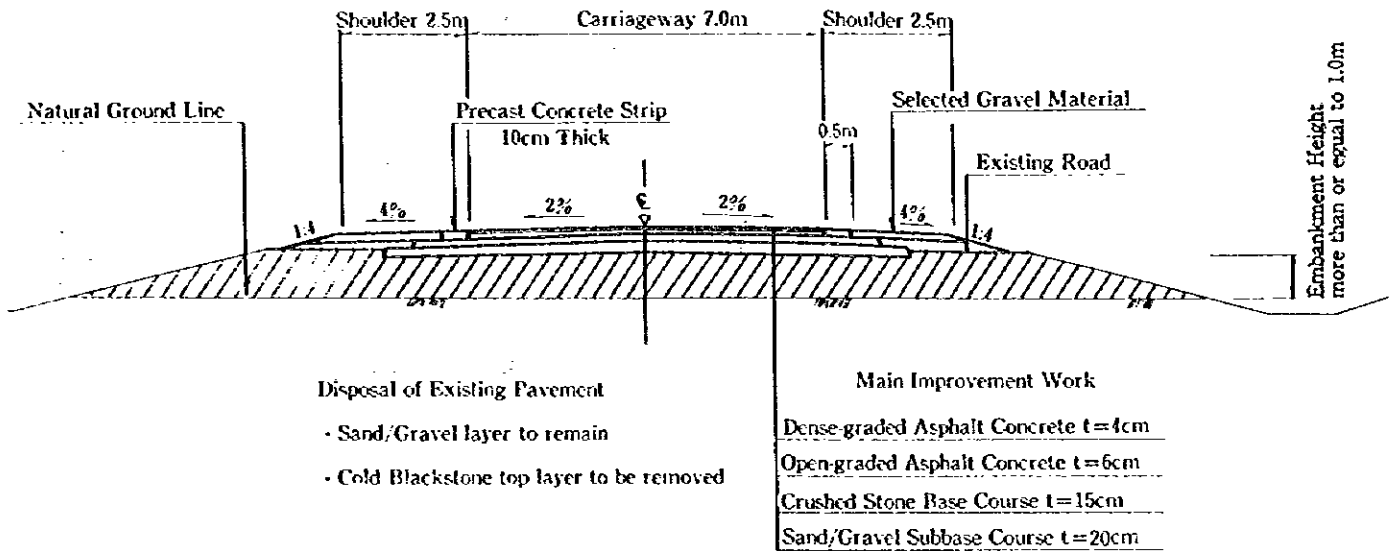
(4) : Cross-Section of Road for Type-III-2 Improvement
